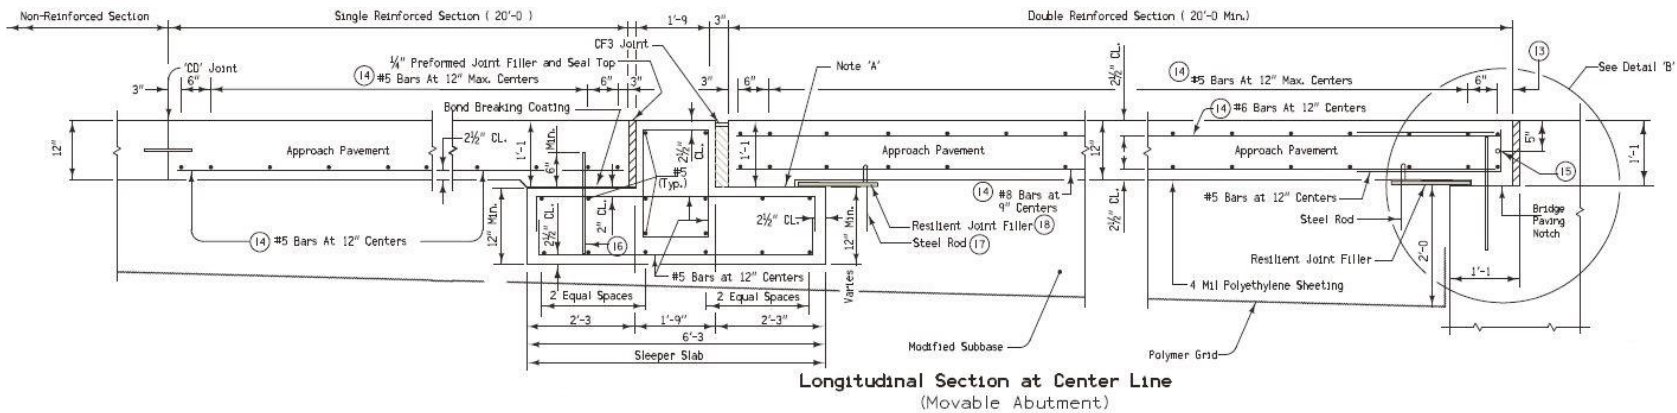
108 Blackhawk Approach Slab Section (Iowa DOT)
